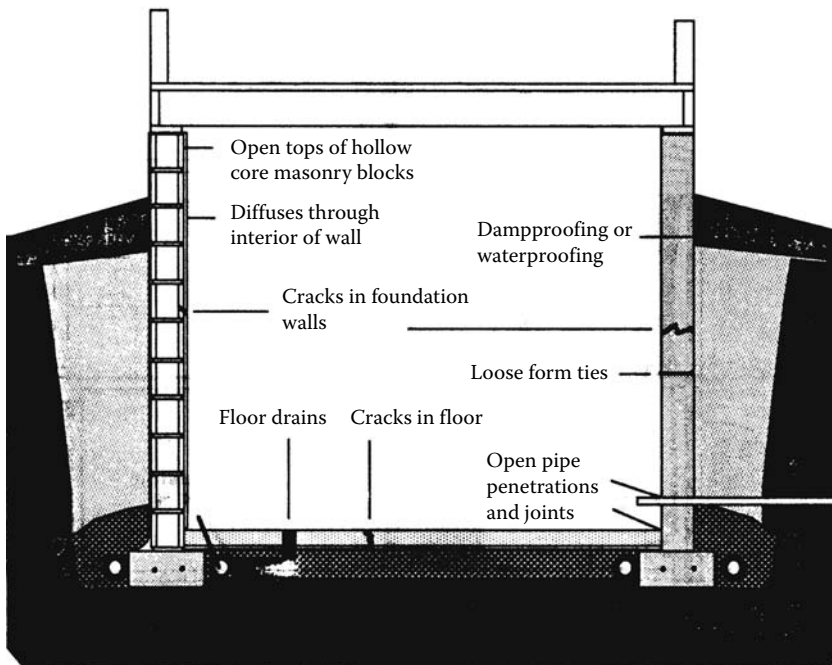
Typical radon entry routes in basement foundations. (Adapted from U.S. EPA, *Radon-Resistant Construction Techniques for New Residential Construction—Technical Guidance*, EPA/625/2-91/032, U.S. Environmental Protection Agency, Washington, DC, February 1991.)
